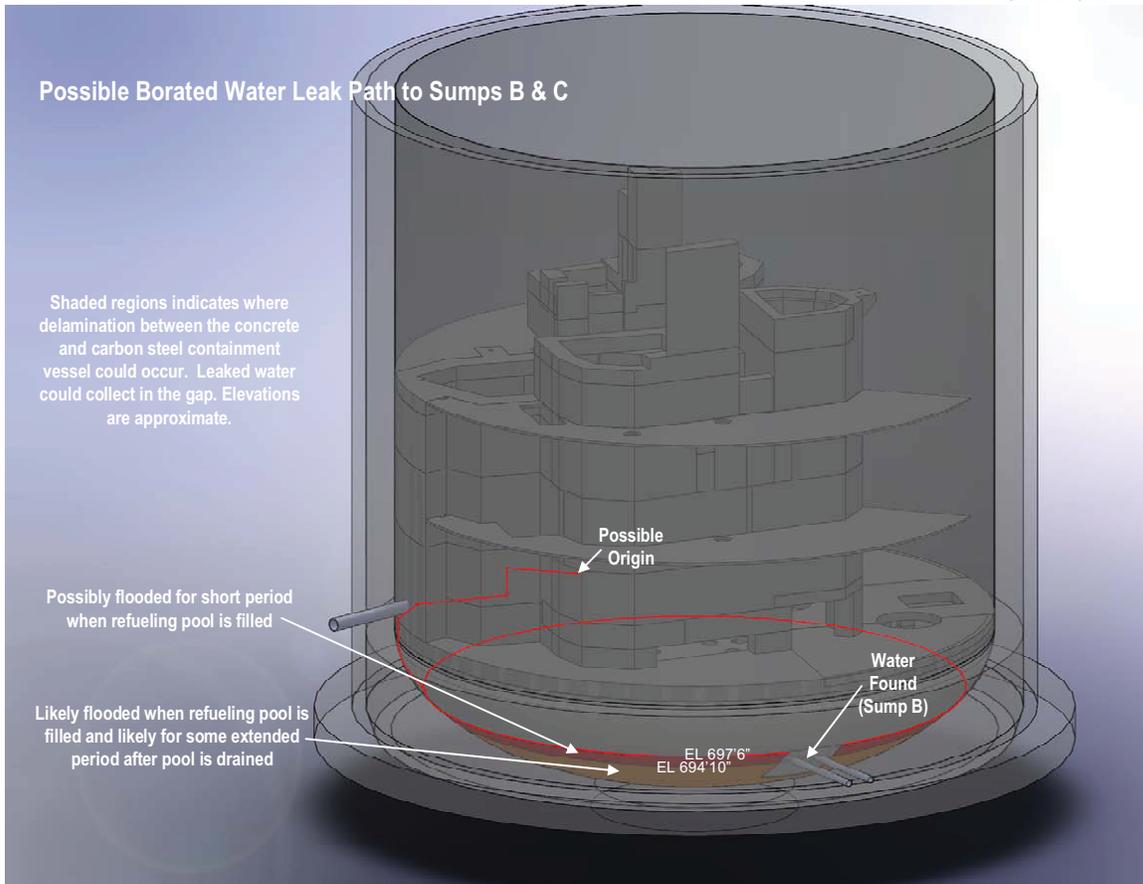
Lower Regions Wetted by Possible Borated Water Leak Paths to Sumps B & C in Unit 2 – Top 3D View
